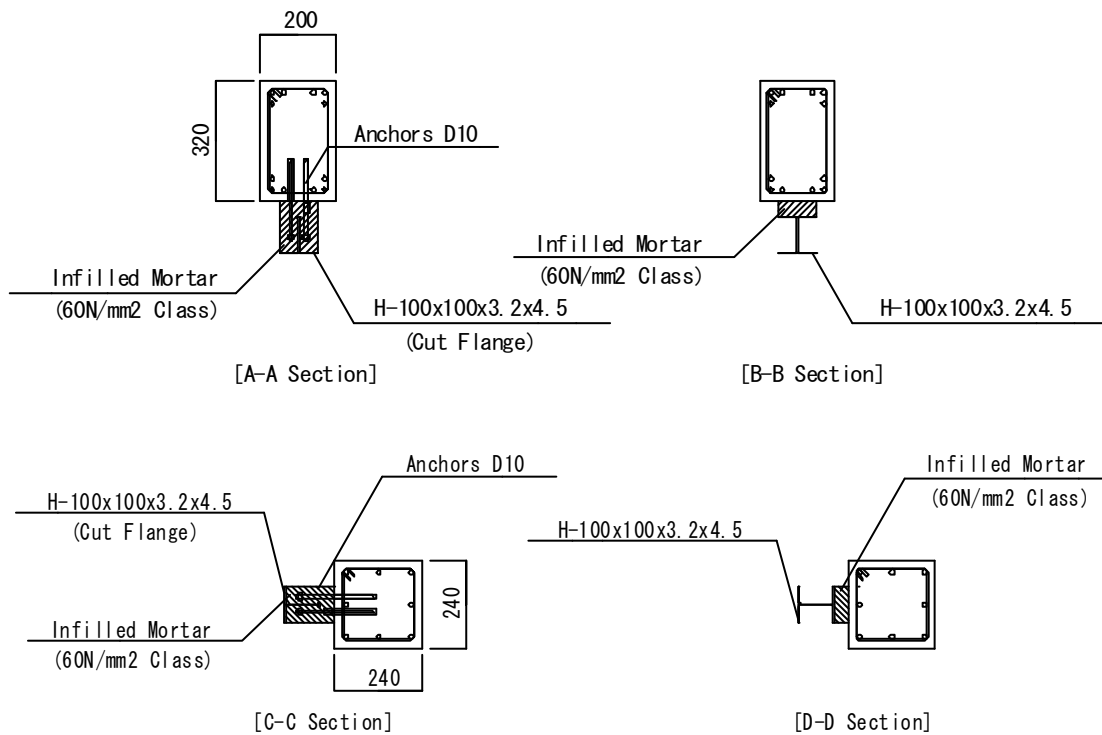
Sections of specimen frames of PA6, PA12, PA16 and PA21
